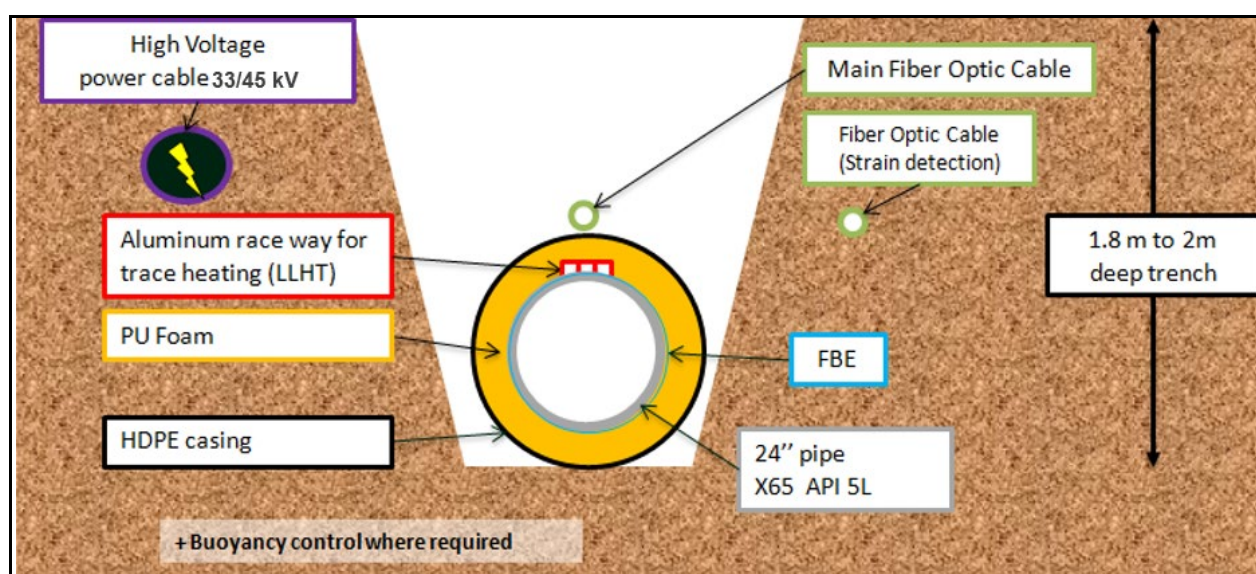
Typical EACOP Pipeline Cross-Section
